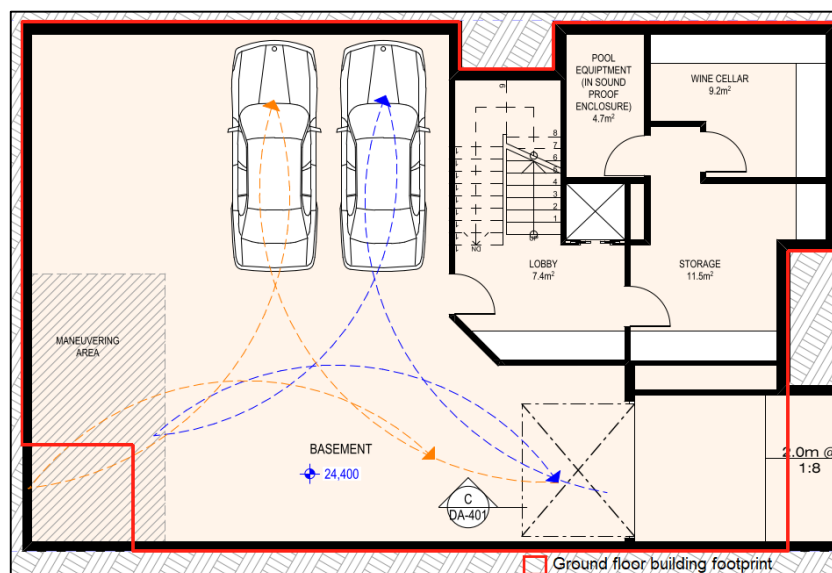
Proposed basement floor plan with ground floor building footprint outlined in red.
